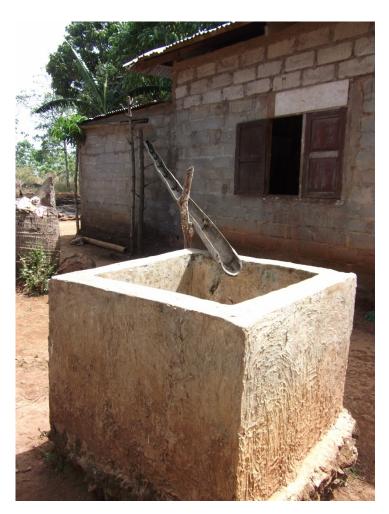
Rainwater collecting tank and bamboo pipe, Triloka area
